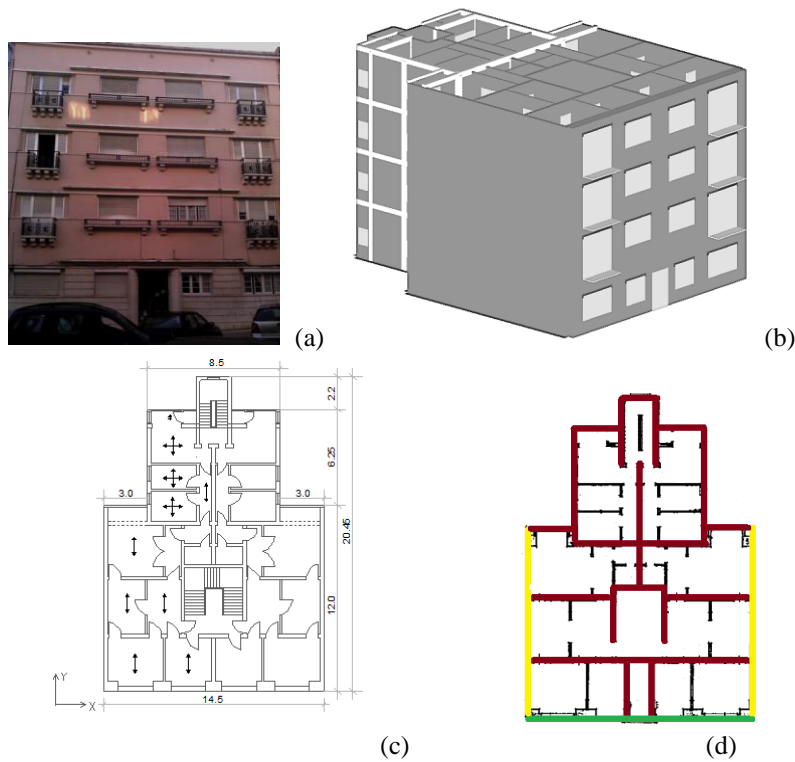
Building type D: (a) front façade; (b) and (c) three-dimensional view and plan geometry; (d) distribution of the walls: green (front façade walls), red (interior and exterior walls), yellow (gable walls), black (partition walls)
